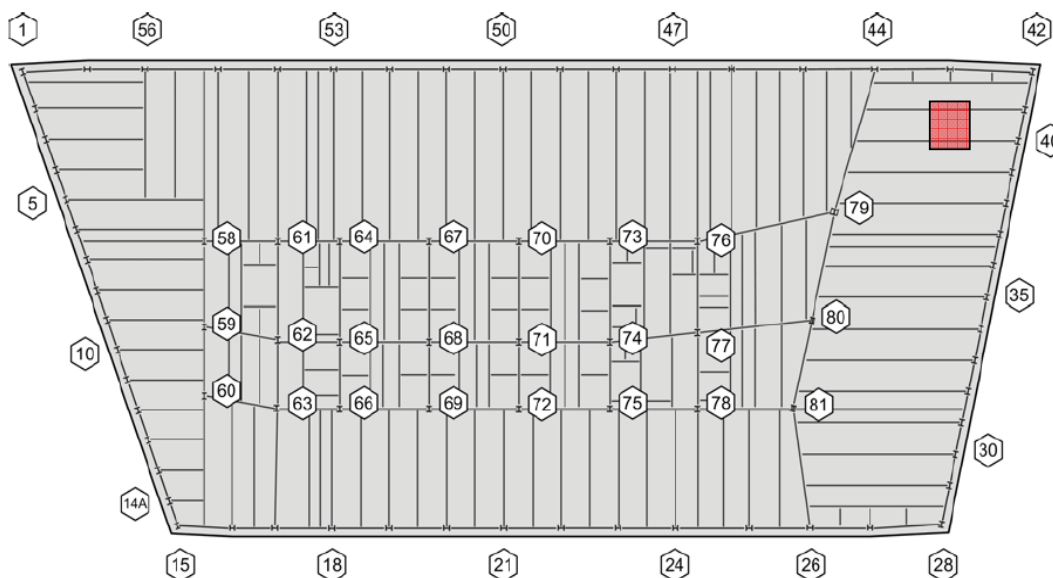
Floor plan of WTC7 with approximate area of ASTM E119 test specimen superimposed (red rectangle).
